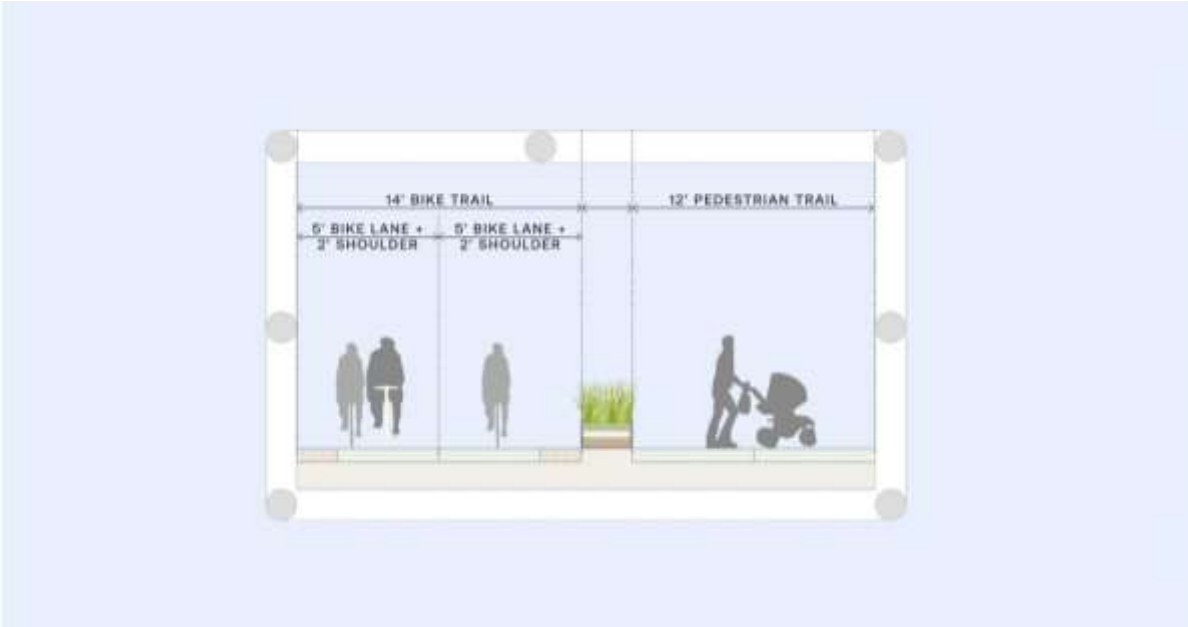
Section of the west tie-in structure, Steel Truss Cantilever alternative.
